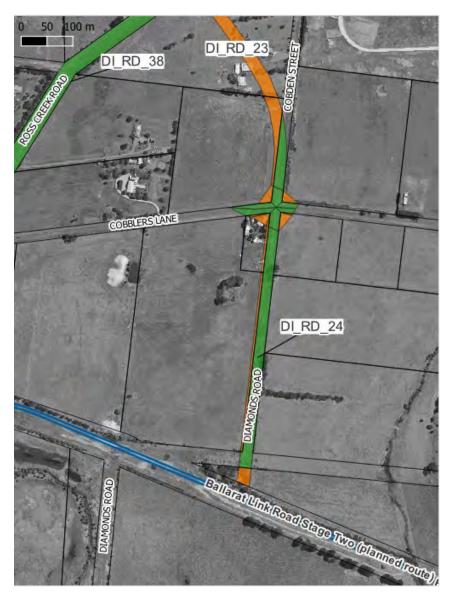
DI_RD_24 existing road (green) and future widening (orange)
